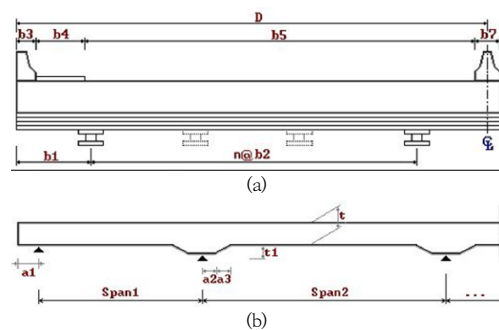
Cross section of slab bridge; (a) Drawing of cross section (b) Drawing of longitudinal section
